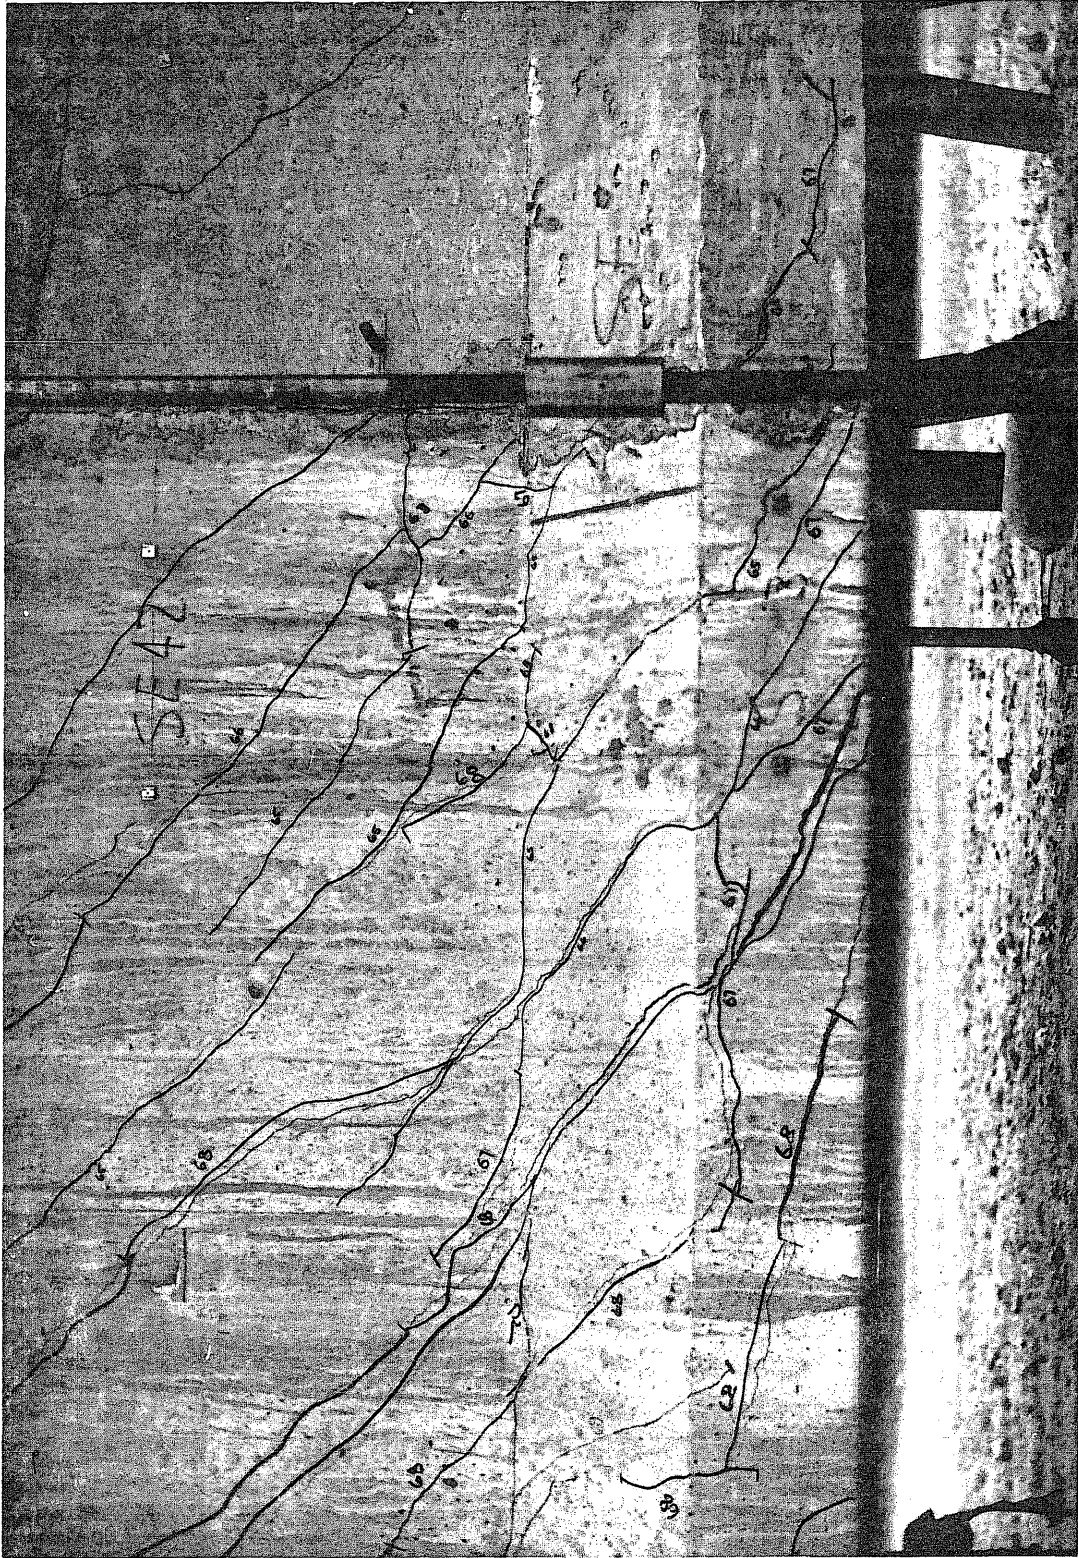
PHOTOGRAPH OF CRACKING SOUTH OF SOUTH SPLICE, LOAD 69,
